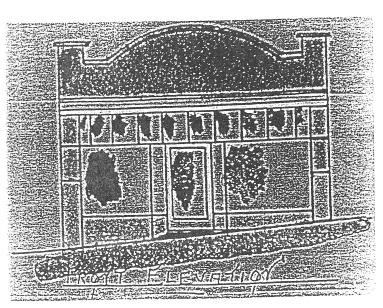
1612-1614 High Street, showing facade prior to refurbishment, c. 1932, Malvern Archives drawing collection.
